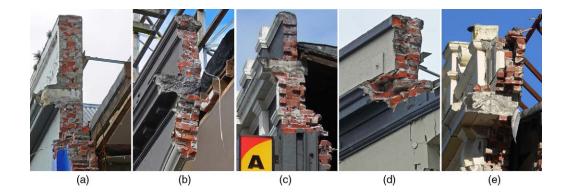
Different positioning of cornice within parapet cross section: (a) limestone cornice, above roof level; (b) concrete cornice, above roof level; (c) concrete cornice, under roof level; (d) clay brick cornice, above roof level; (e) limestone cornice and ornamental features at the top.
